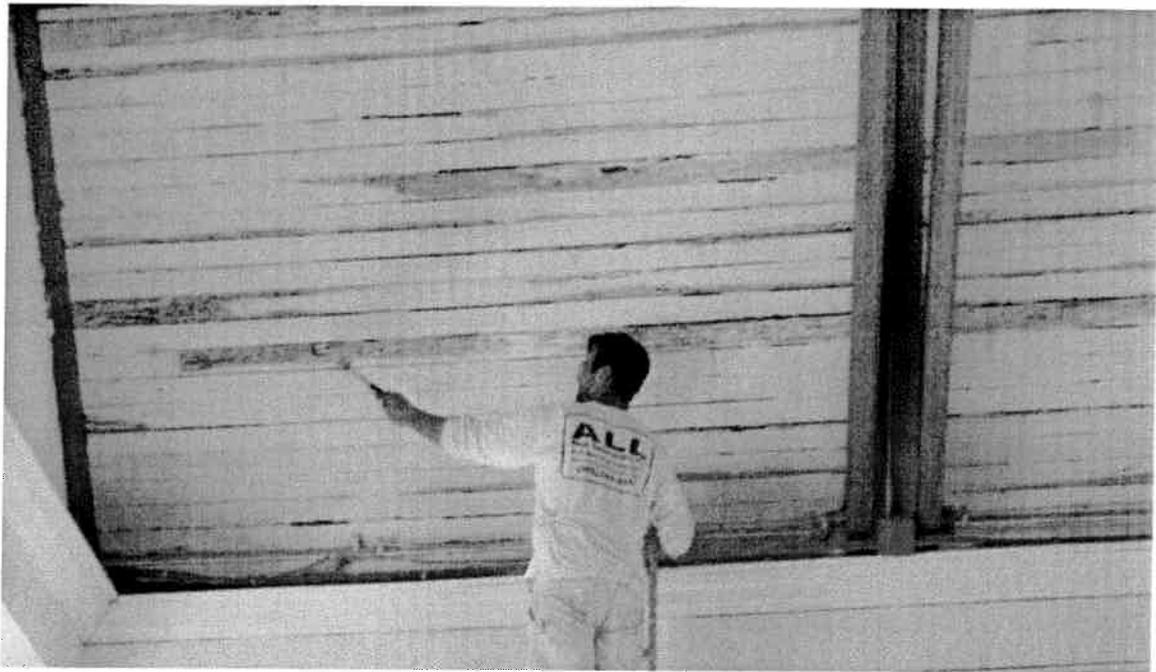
Damaged Ceiling from Roof Leaks
